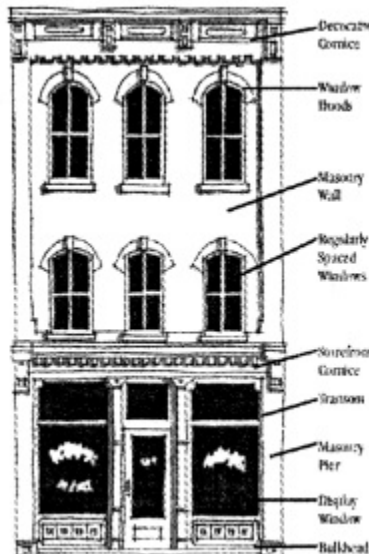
C: EXAMPLE OF STOREFRONT WITH WINDOWS AND DOORS ALONG STREET FRONTAGE
